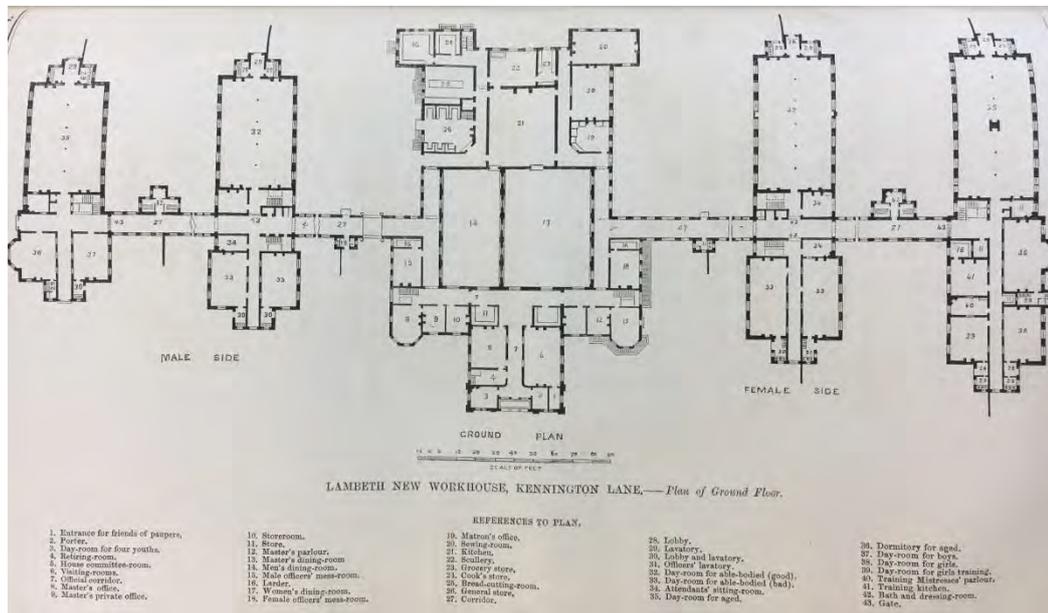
Lambeth New Workhouse. Published in The Builder, Jan. 24, 1874
